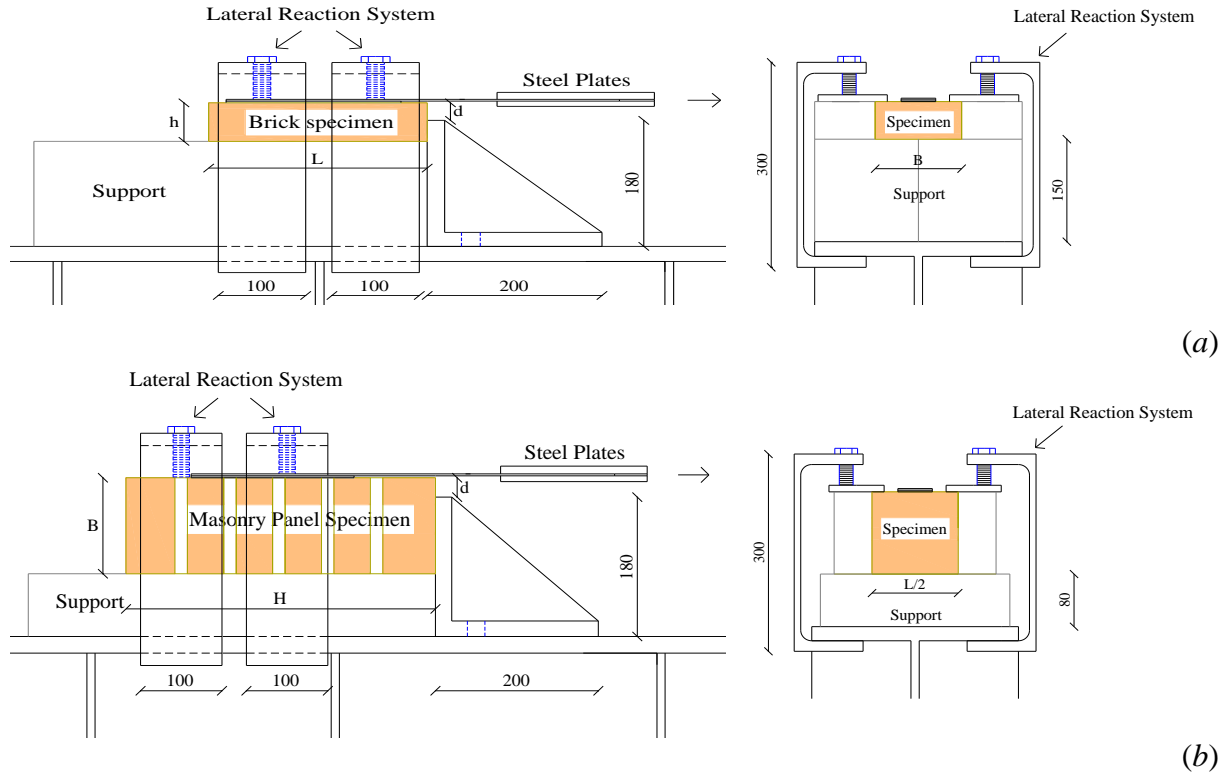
Experimental Setup: (a) Brick Specimen; (b) Masonry Panel Specimen.
